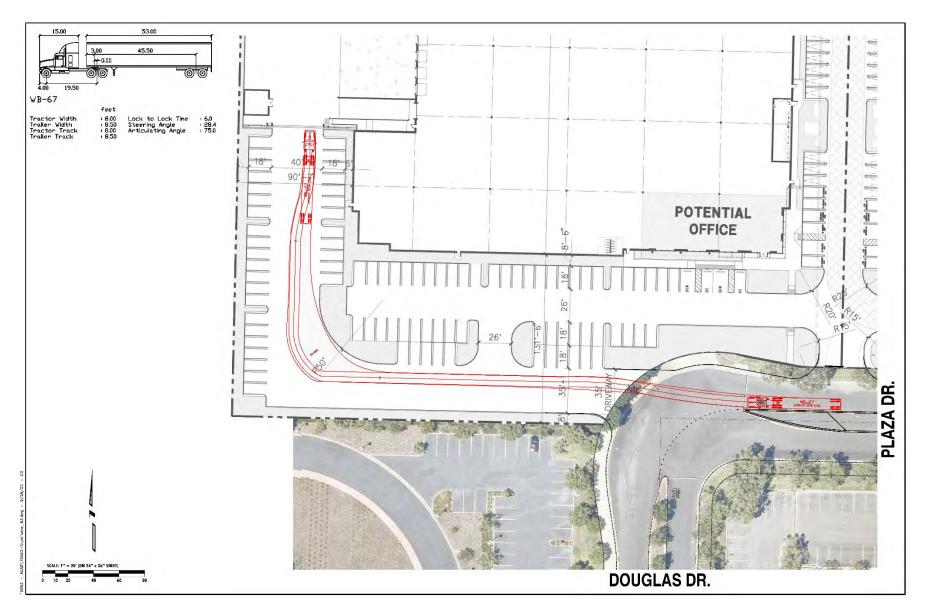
OUTBOUND TRUCK ACCESS AT DRIVEWAY 1
